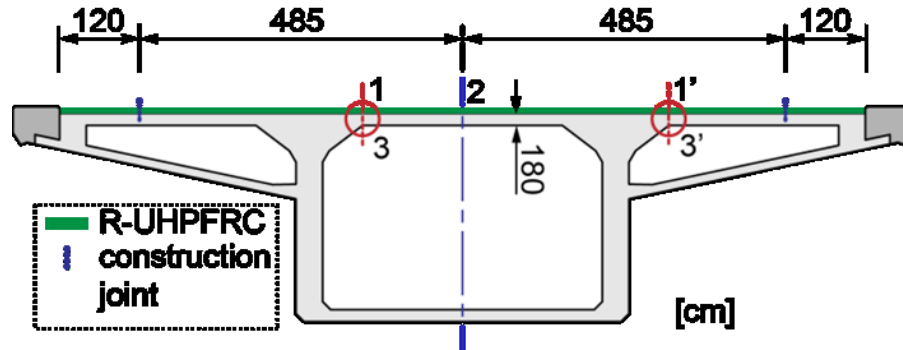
Geometry of the box girders cross-section (thickness of R-UHPFRC layer: 50mm over piers and 40mm in the spans).
